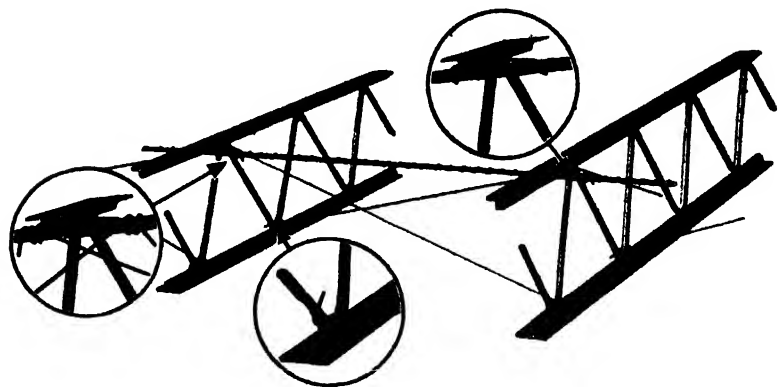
,685.—Showing bridging method for open truss steel joists. This bridging method popularly termed *strut bridging* is very popular and easy to install. It is made of $\frac{3}{4}$ inch box channels and cut to lengths to meet the exact spacing of the joists. This bridging holds the joists in a vertical plan, assuring accurate spacing and distribution of loads by acting in both tension and compression.
